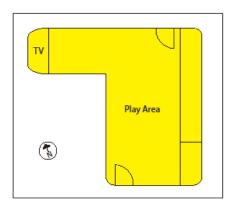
Brenner's 6th floor Play Room Plan. Not to scale.
